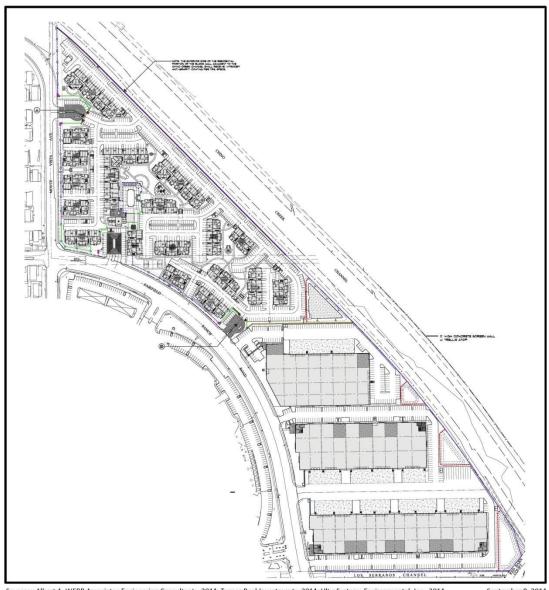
PRELIMINARY FENCE AND WALL PLAN
